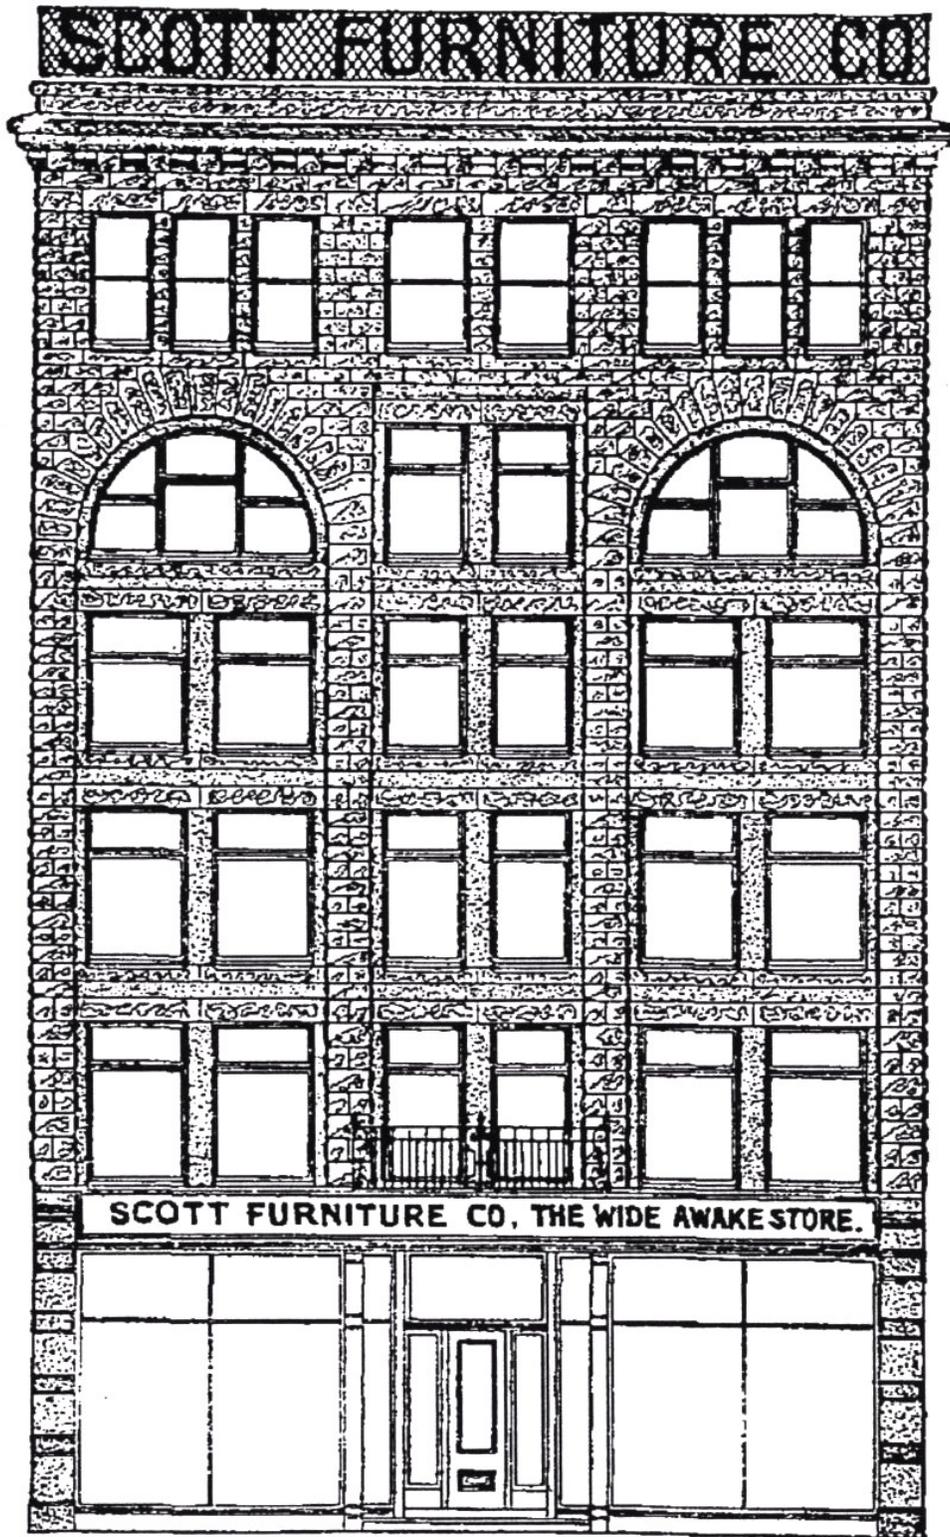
The Scott Block, 272 Main Street, architect's rendering of front (east) façade, 1904.
